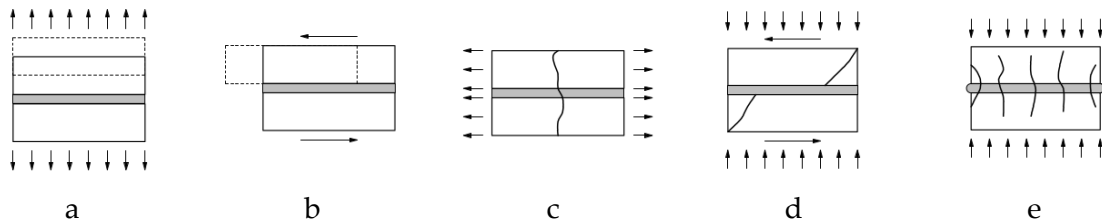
Masonry failure mechanisms – (a) tensile cracking of joint, (b) slipping of joint, (c) unit direct tensile cracking, (d) unit diagonal tensile cracking, (e) crushing of masonry from [39]
